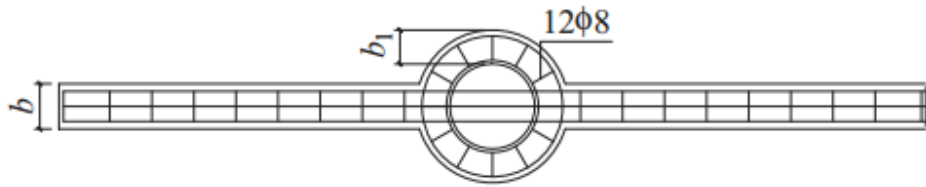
Details of TWSTCC (STCC) and CFST test joints (unit: mm) (Han et al., 2009)
